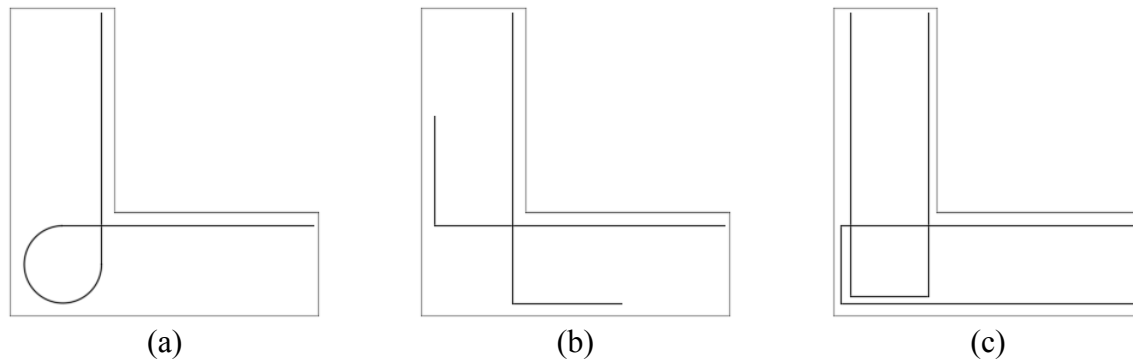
Detailing Recommendations for Corner Bars (Reproduced from Joint Committee on the Detailing of Reinforced Concrete, 1970)
